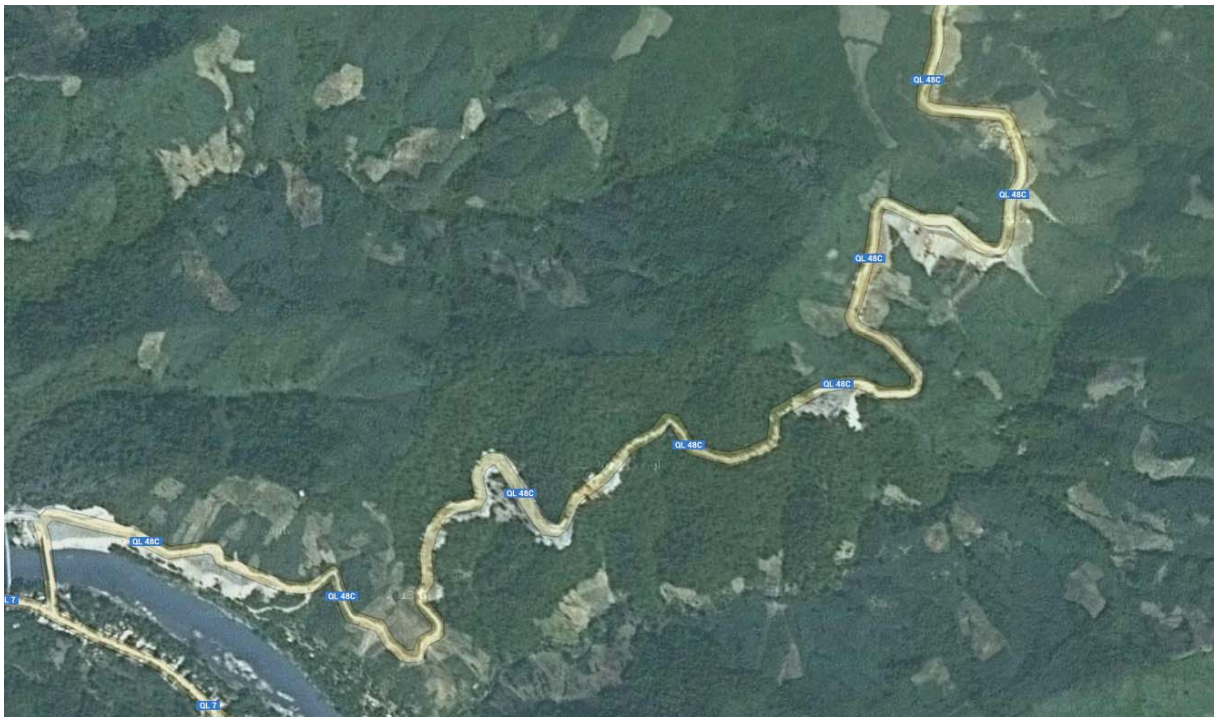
Example of impact of recent road construction on slope stability. Due to many cutslopes and dumping of materials new landslides develop rapidly after road construction.
